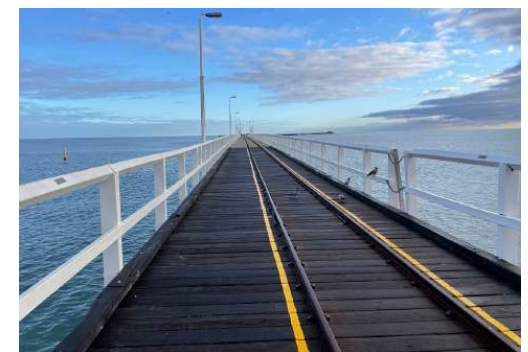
View of timber decking to Jetty Section 1- West showing timber balustrade and kerb-rail detail. *H+H Architects, 2022.
